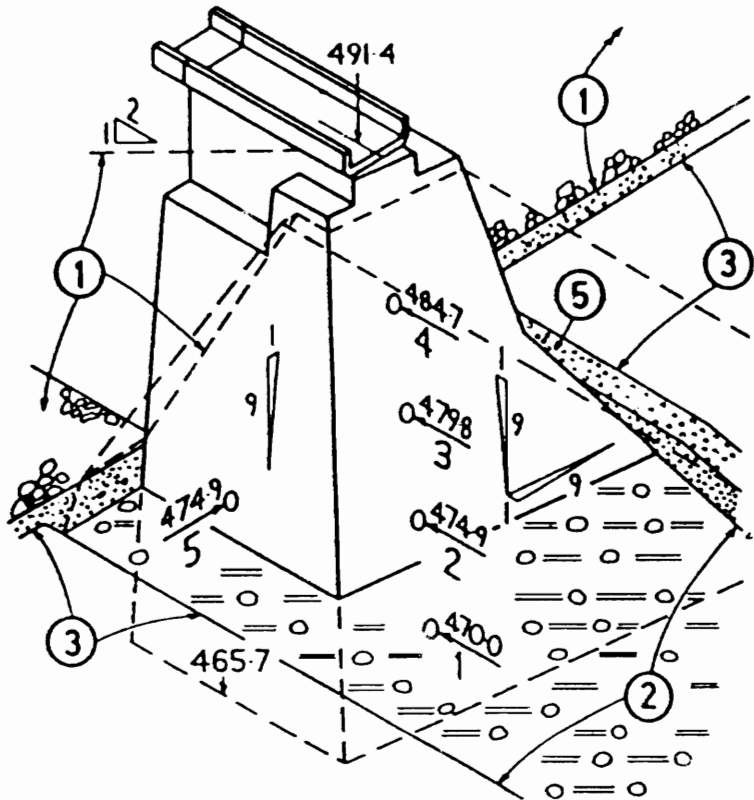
Soil-Concrete Interface Detail and Instrumentation Layout, Cow Green Dam (Vaughan and Kennard, 1972).
